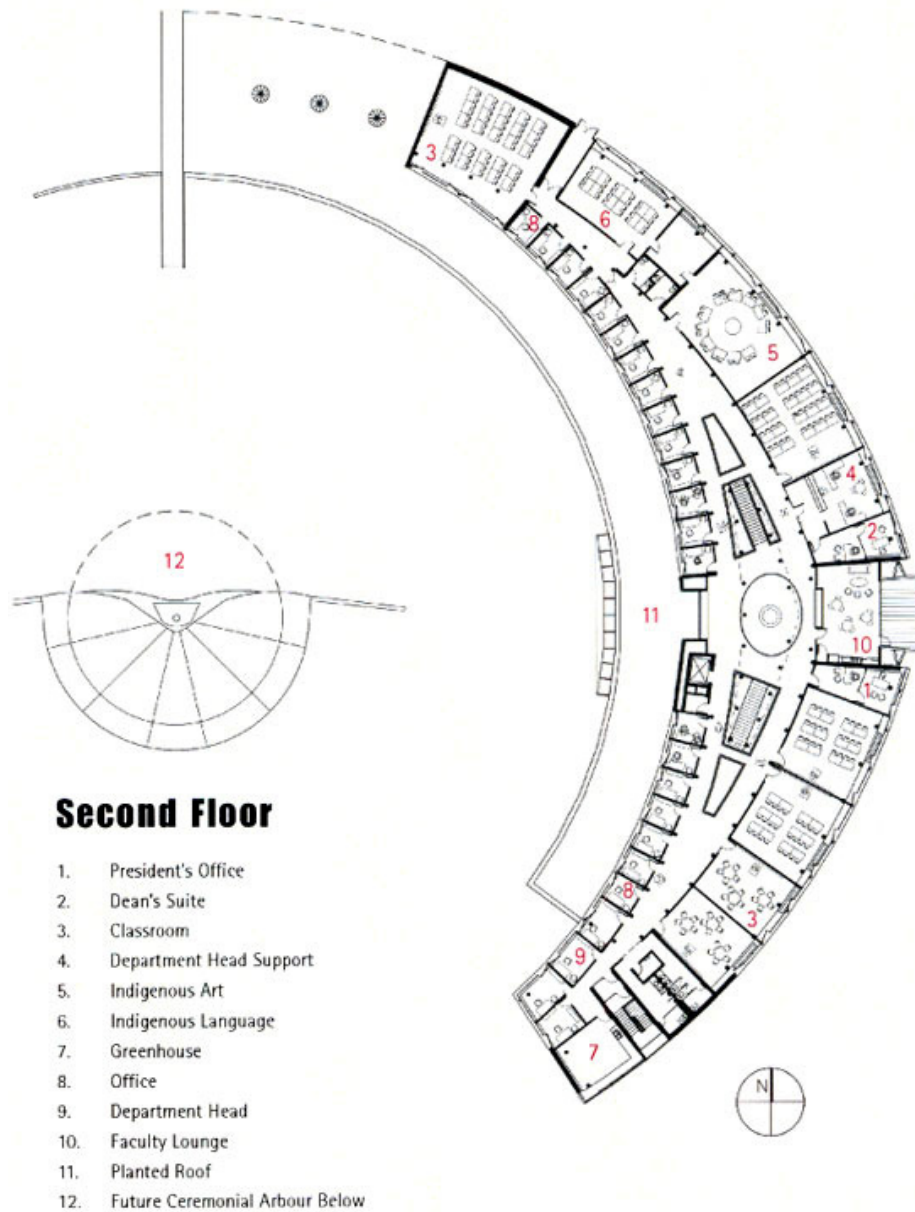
(Left): Second Floor Plan (Entry). Figure 4 (Above Right): Lower Level Plan.
